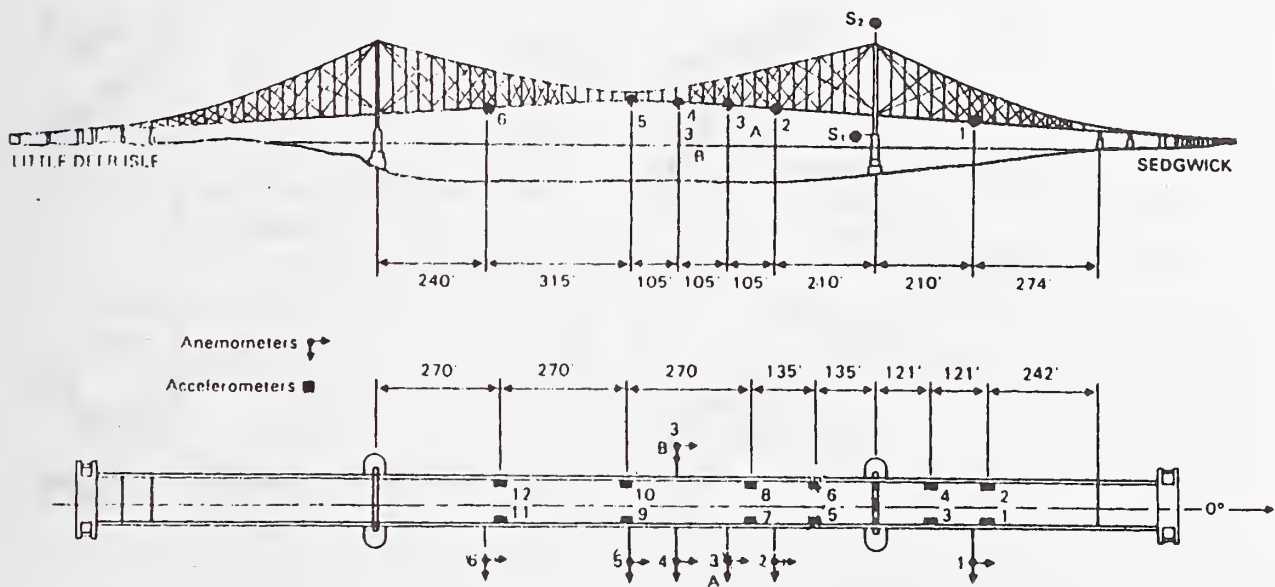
Deer Isle - Sedgwick Bridge -- Instrumentation Layout
